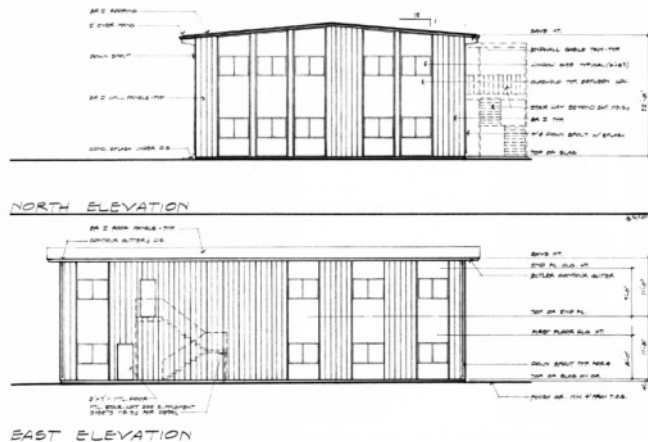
North[west] and [north]east elevations of 327 Bonair Siding Road, 1982. Prepared by Raiser Architectural Group. Source: Stanford LBRE.
